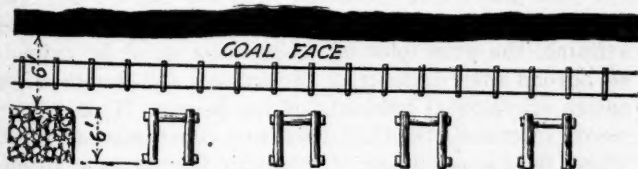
SHOWING TIMBER COGS ON LONGWALL FACE
